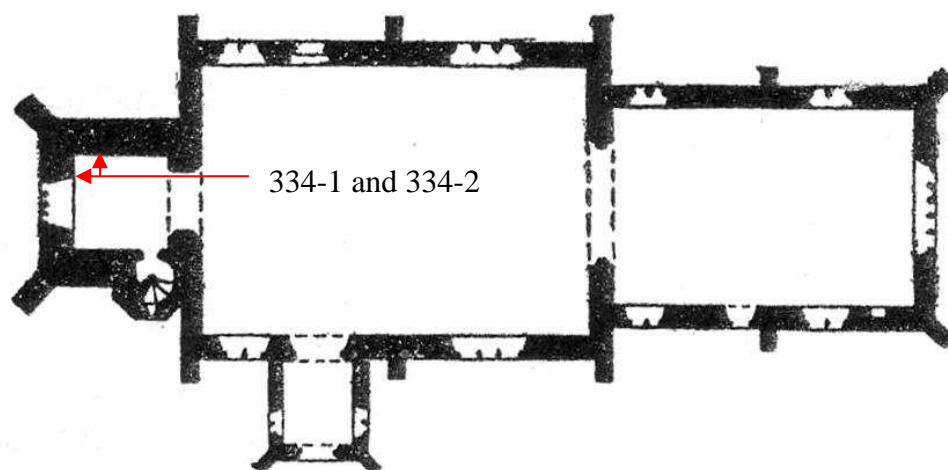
Sampling location in Tilbury-juxta-Clare church. Note that this plan only shows the ground floor of the church. The samples was collected from the second stage of the church tower (RCHME, 1916, 319).
